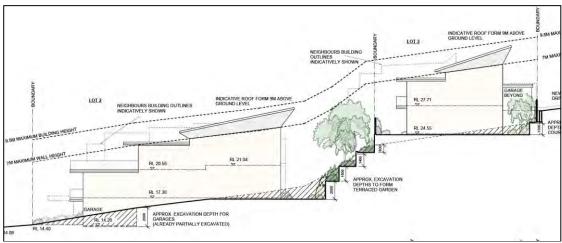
'Potential built form diagram - South eastern elevation' DA-05
